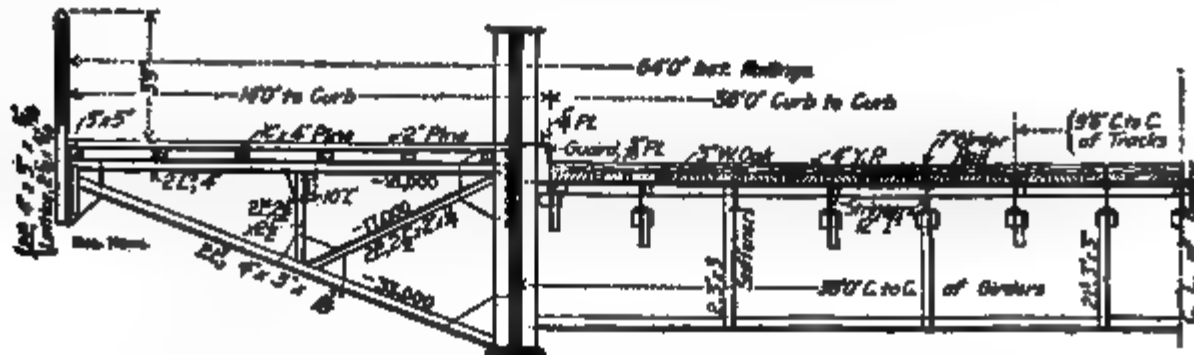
PLATE GIRDER FLOORBEAM AND SIDEWALK BRACKET.
